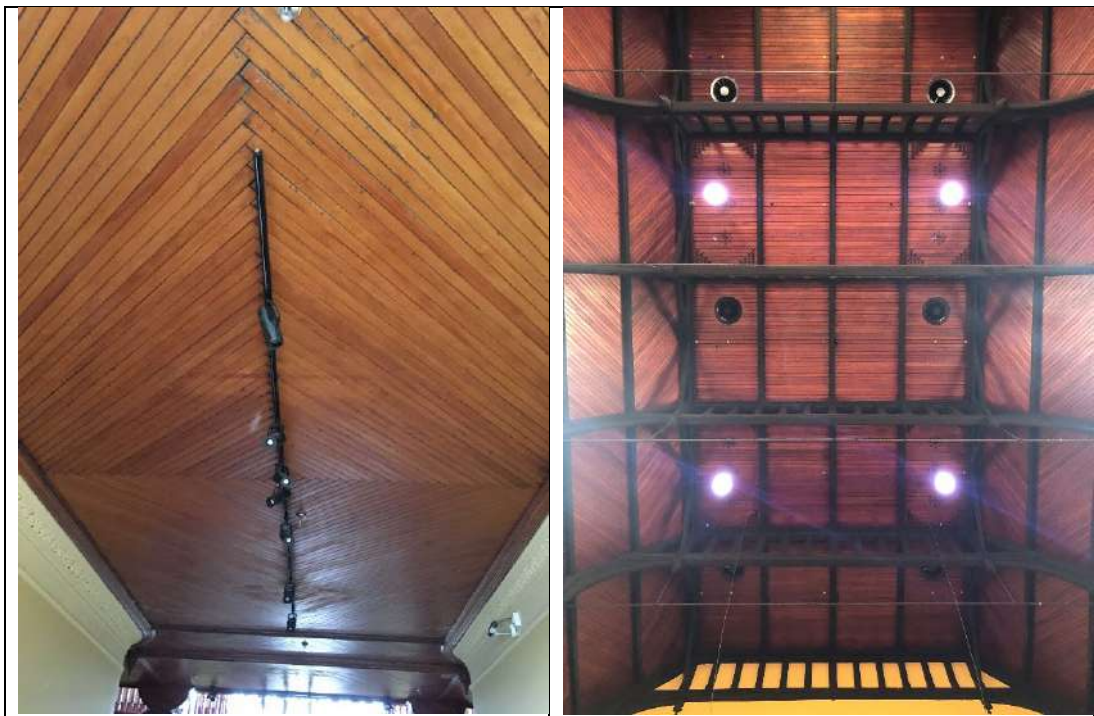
(left) – Original T&G ceilings, central hall, and Figure 77 (right) – Original roof trusses and sarking, central hall.
